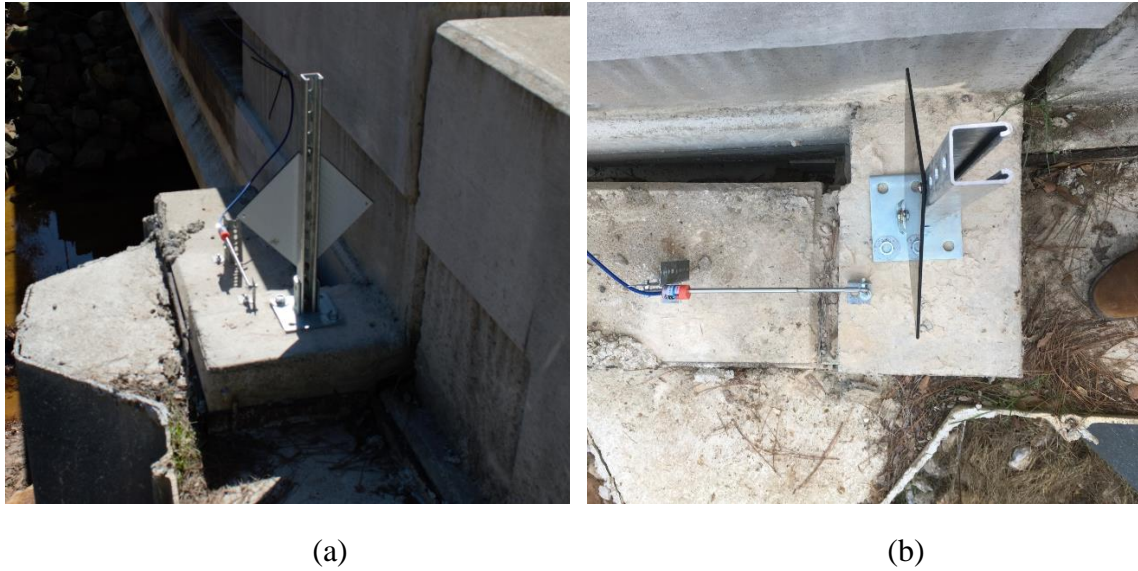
Closeup of equipment installed on the north abutment, laser target and crackmeter installed between backwall and pile cap. (a) view from behind (b) top view
